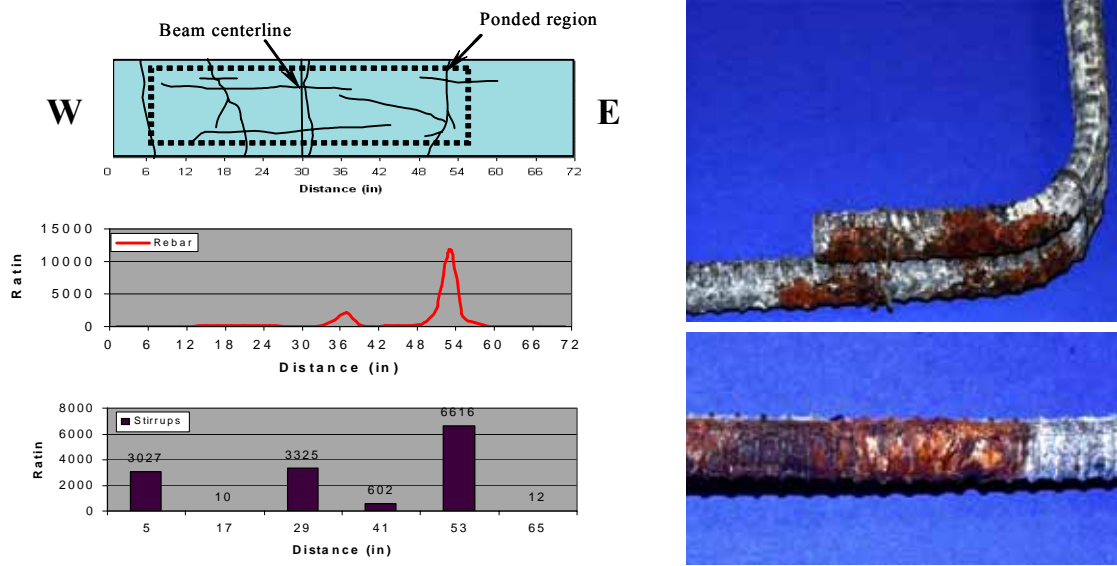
Effect of Transverse Concrete Cracking Due to Service Loading on Reinforcement Corrosion^{37,38}
